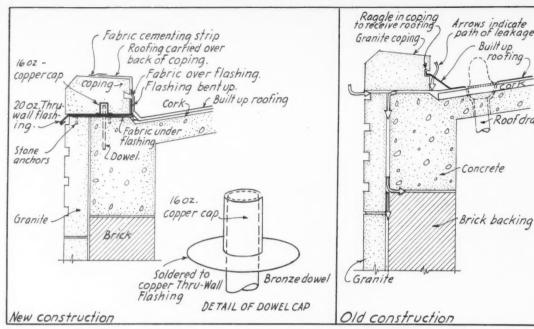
Water entered coping at outside of lower deck as shown by the arrows. Passing between veneer and backup this water entered the building many feet from its en-trance. To stop these paths of travel a through wall flashing was installed as shown. Note especially the coping cap designed to act as a cap flashing.
